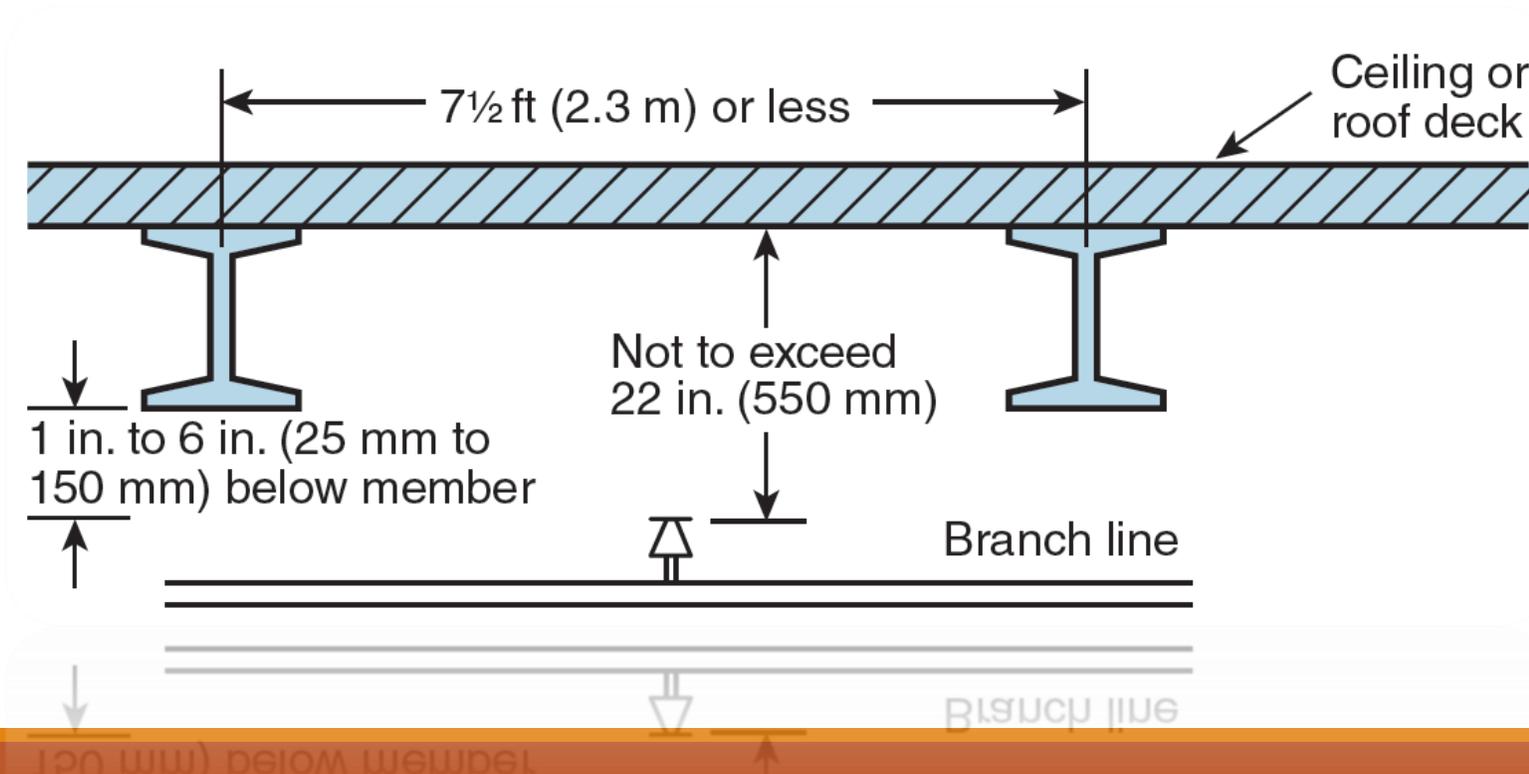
Placement of Standard Spray Upright Splinkers Underneath Obstructed Construction.
